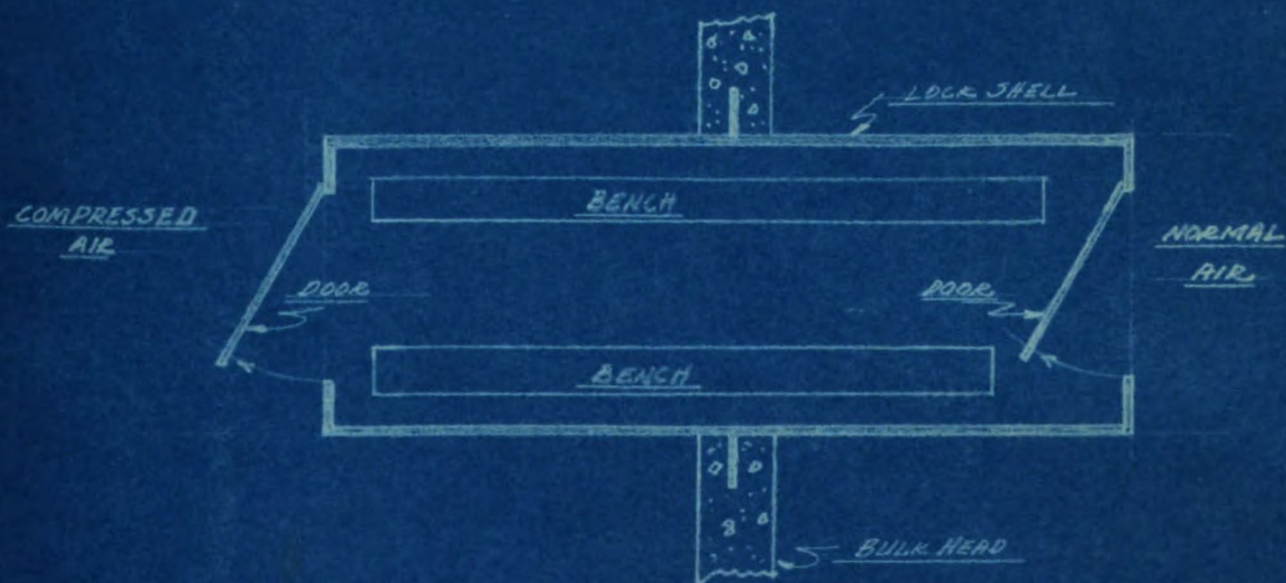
TOP VIEW OF TYPICAL MAN LOCKS.
